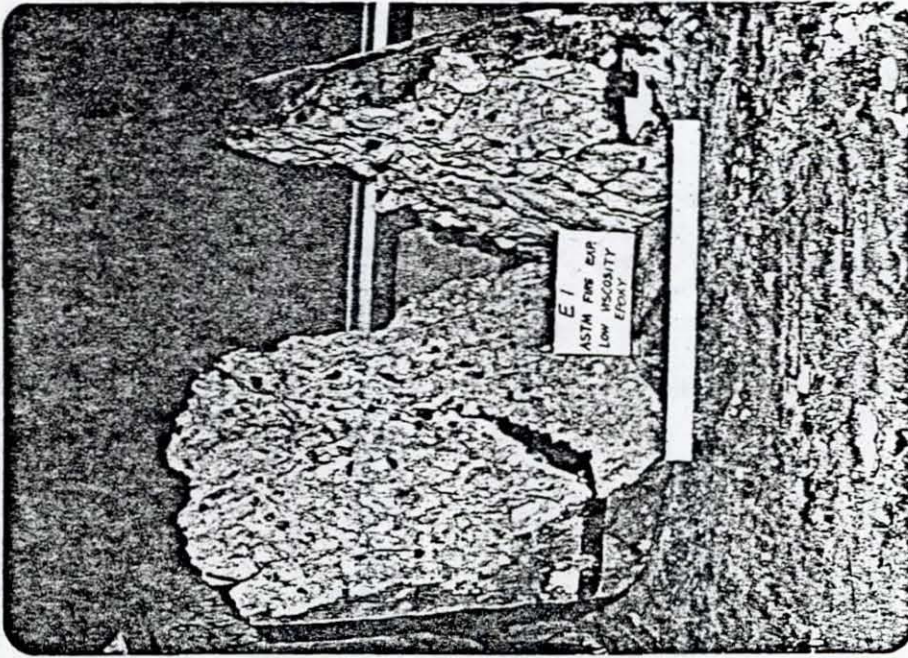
Failure pattern for 8 in Thick Specimen. Note the Shear failure through Concrete not through Epoxy.
